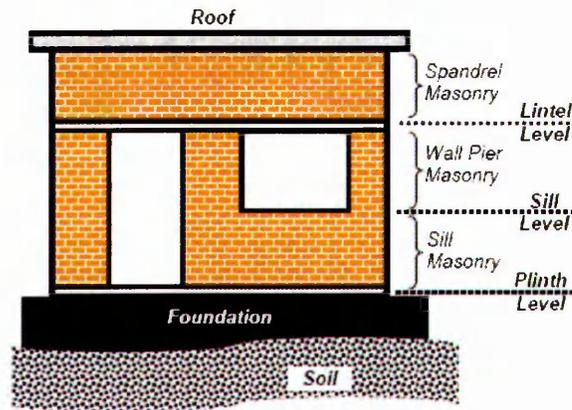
Sub-units in masonry building – walls behave as discrete units during earthquakes (IITK-BMTPC, 2003)
